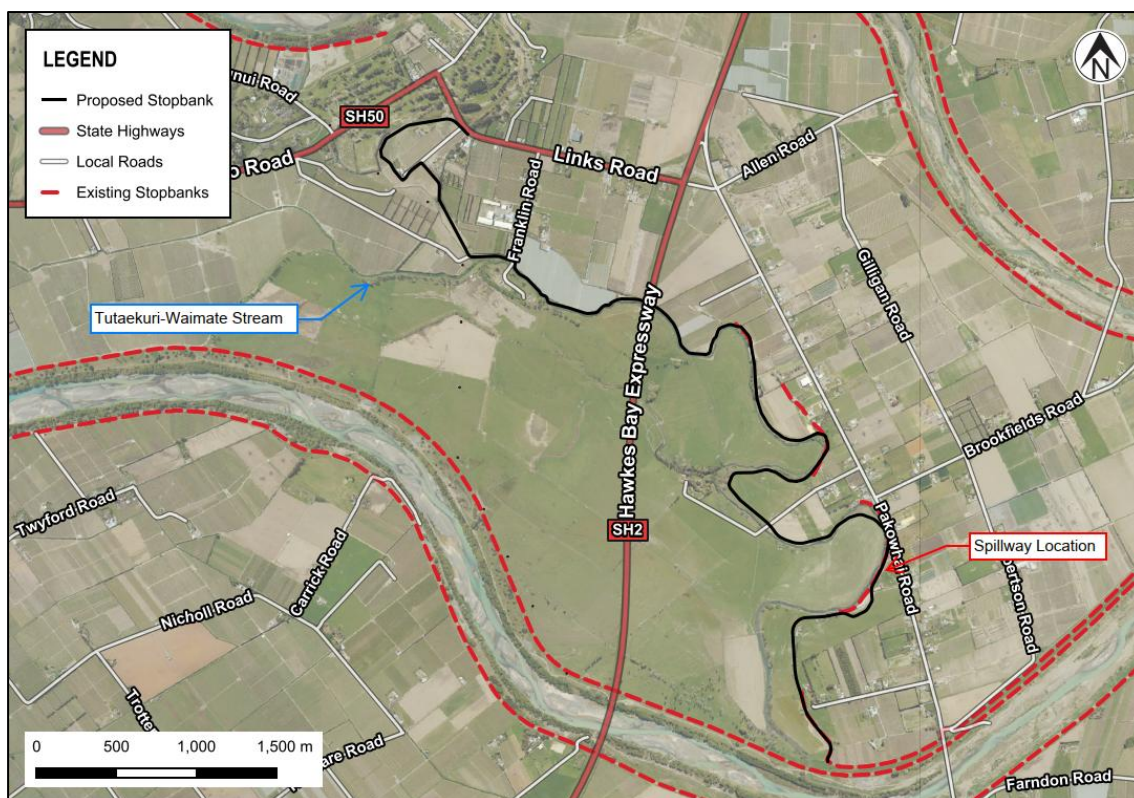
Proposed stopbank alignment and flood control spillway location.
